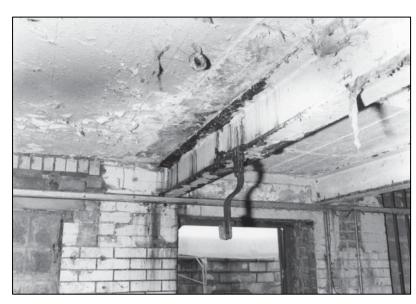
Building A, former rail and hanger over N part of GF, looking E (photo 10/8).
